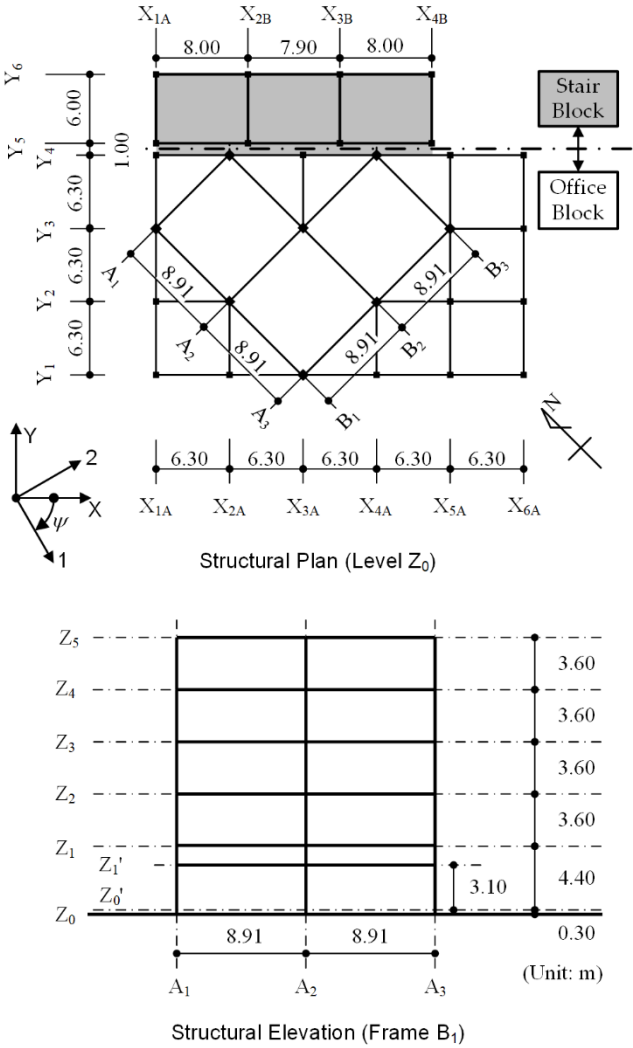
Simplified structural plan and elevation of the former Uto City Hall (Fujii, 2016).
